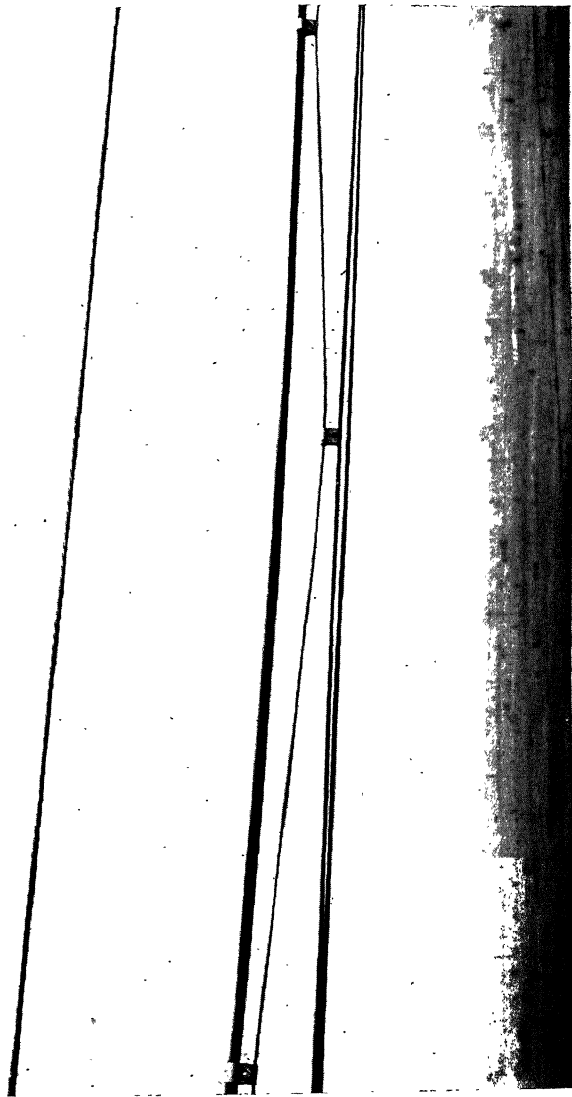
Laced type construction of double wire overhead system, showing method of supporting trolley wire.
